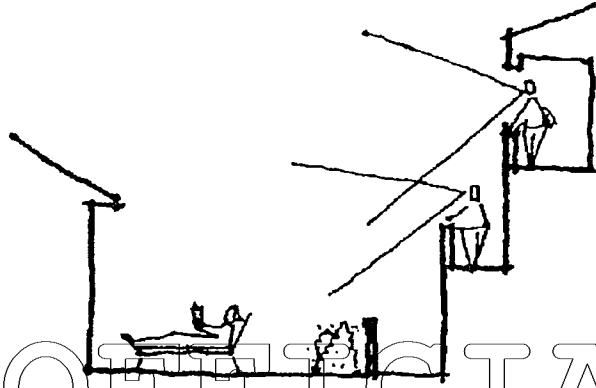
D: Windows and decks that overlook neighboring residential properties and intrude on privacy are not acceptable
